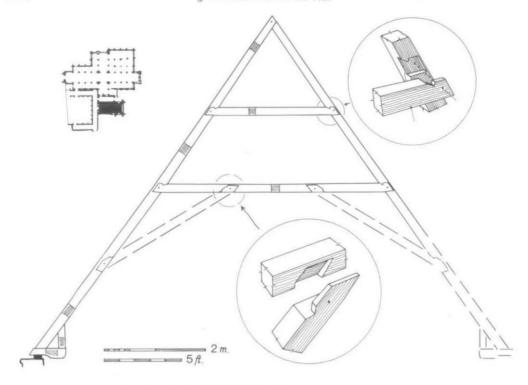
Chapter-house: 13th-century roof-truss, looking W.
